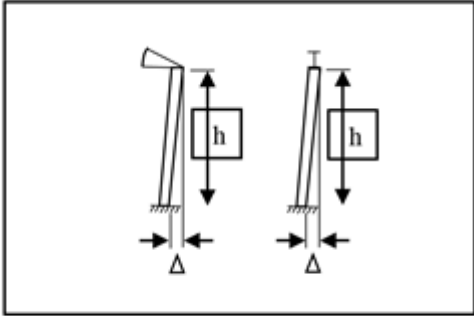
Inclination of single storey columns (British Constructional Steelwork Association, 2010)
